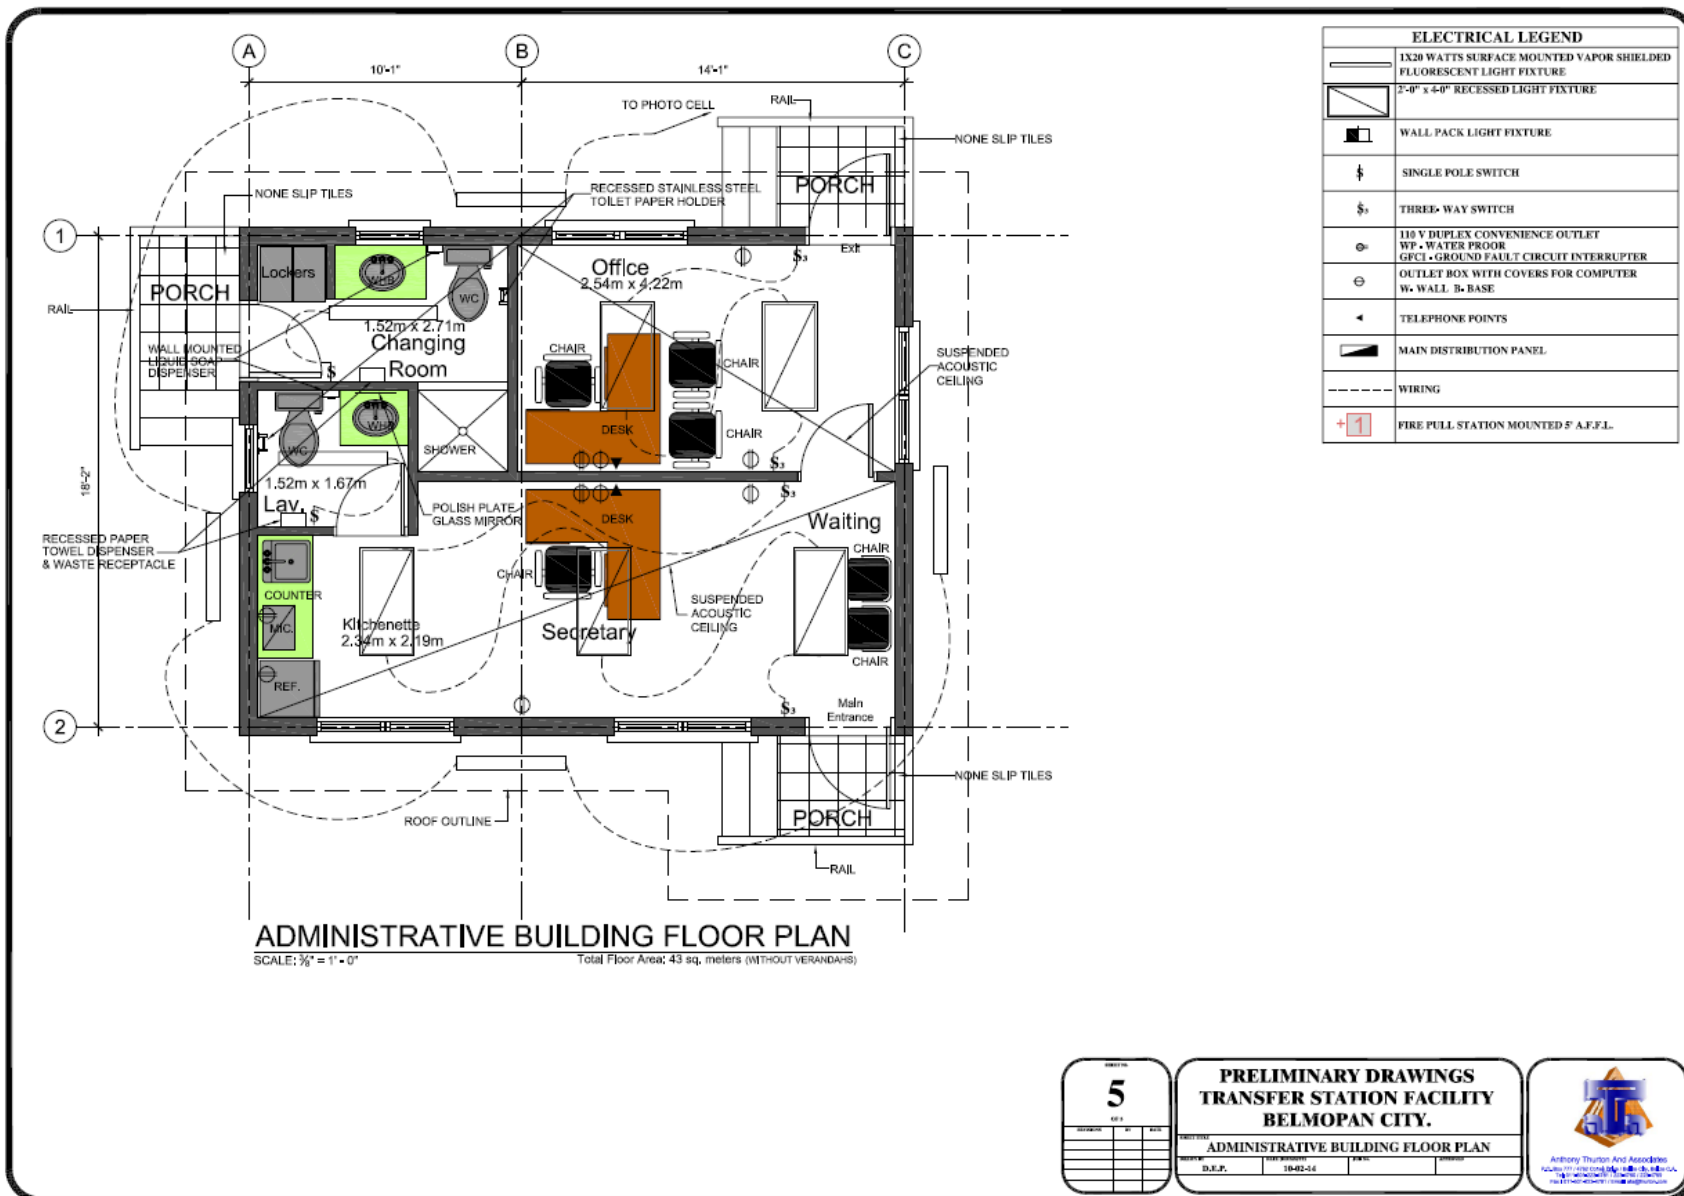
Proposed Belmopan Transfer Station Administrative Building Floor Plan
